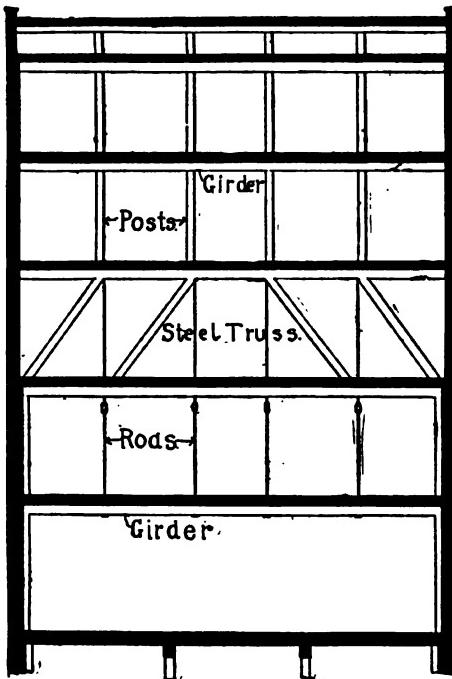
Section of a Building Showing Floors Supported by Truss.
